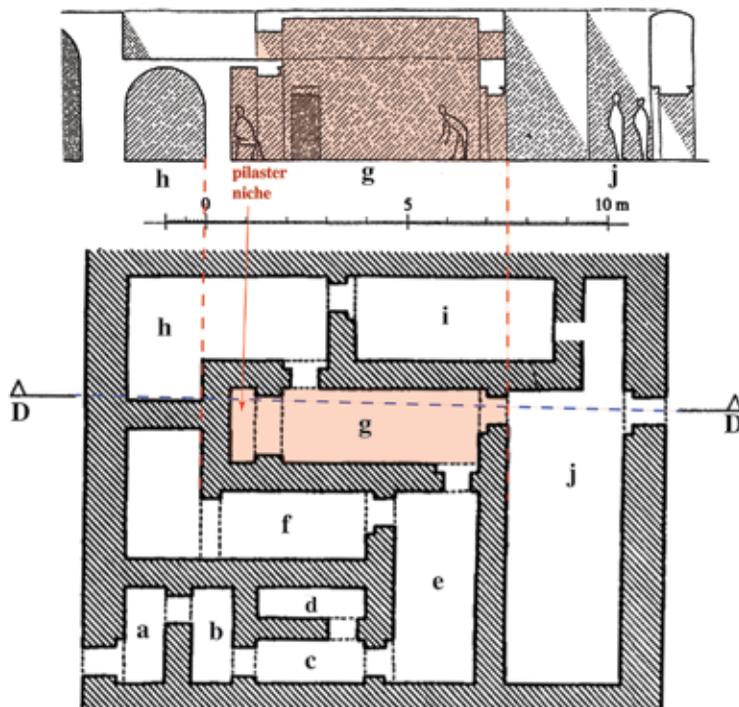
Schematic plan of a “priest’s house” north of the causeway in the Khentkawes Town with one of Felix Arnold’s reconstructed profiles across the central room (g, highlighted red). Pilasters define a niche at the southern end of room g (from Arnold 1998, figs. 7–8)
